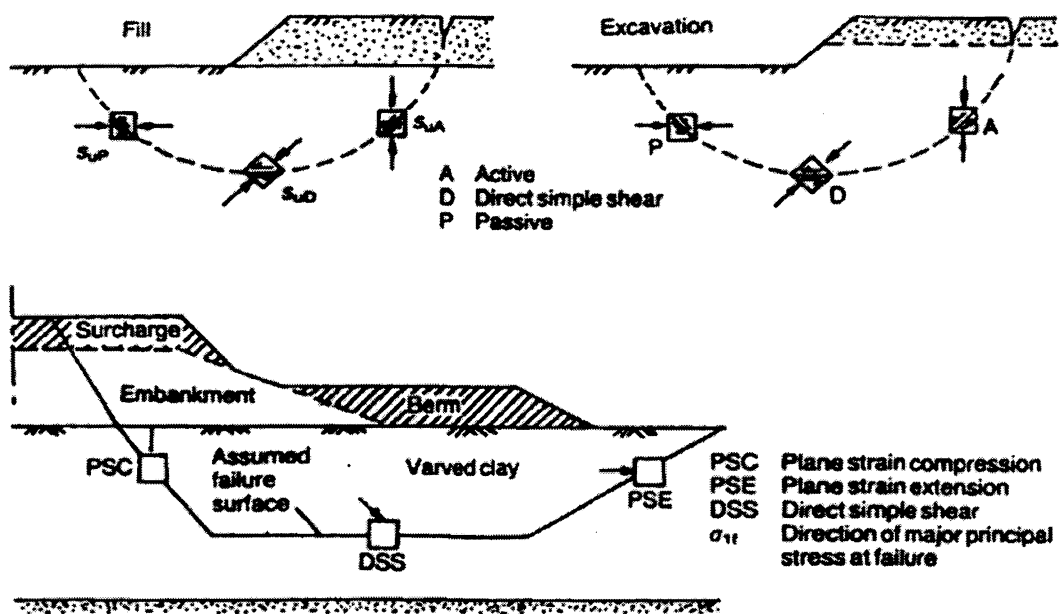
Example of simple shear conditions within an embankment foundation
